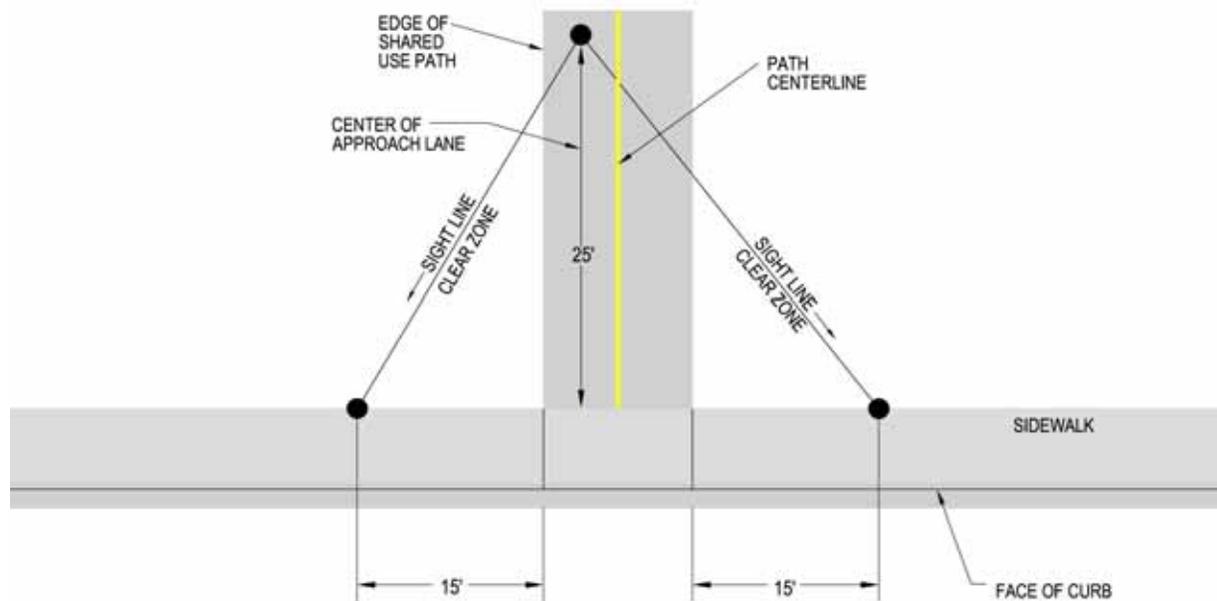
Minimum Sight Distance Triangle at an Intersection with a Sidewalk
